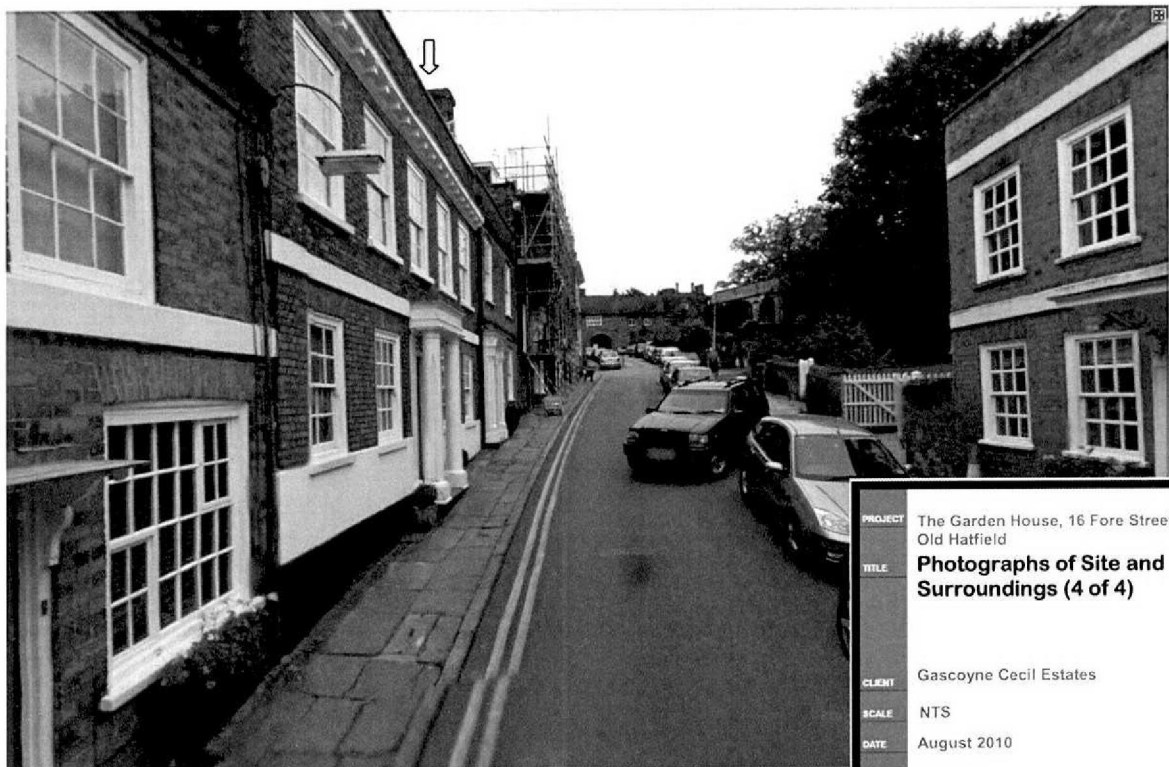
Streetscene view showing the frontage of No. 16 (left hand side)
